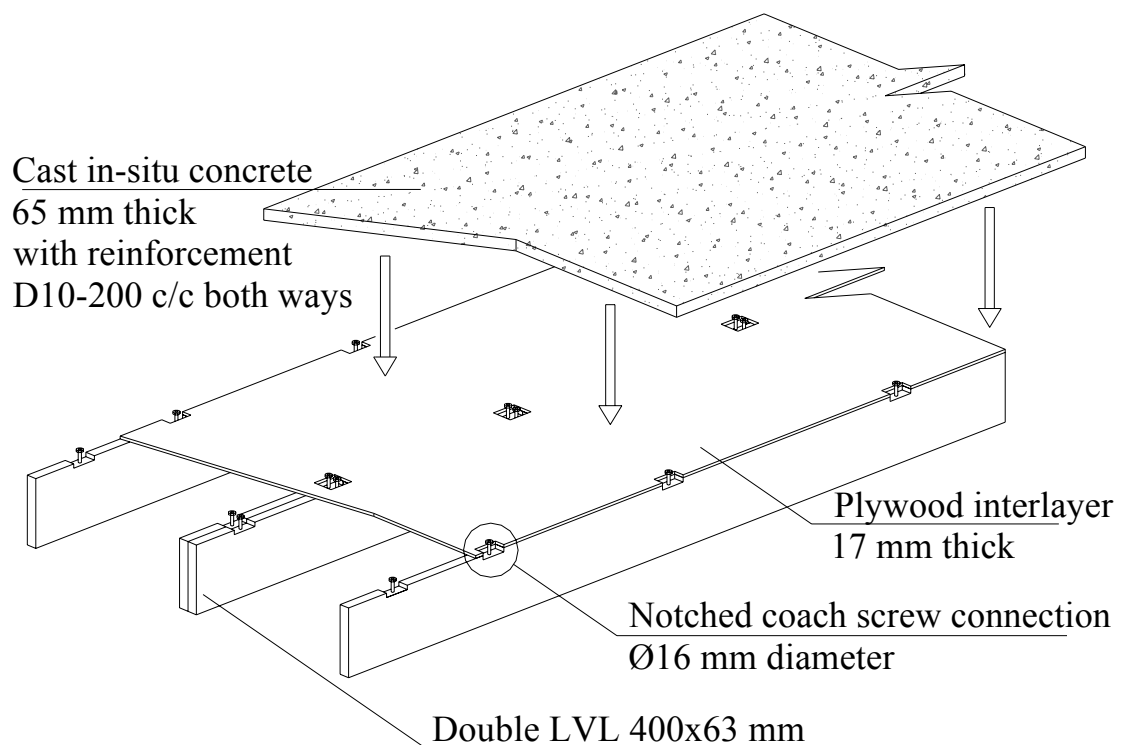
Proposed semi-prefabricated TCC floor system
